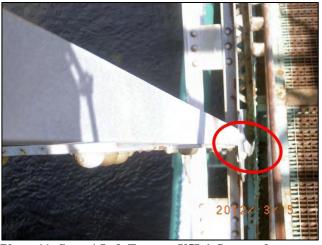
Span 1 Left Truss at U5L6: Impact damage in lower half, looking from U5 <12-0024a>
